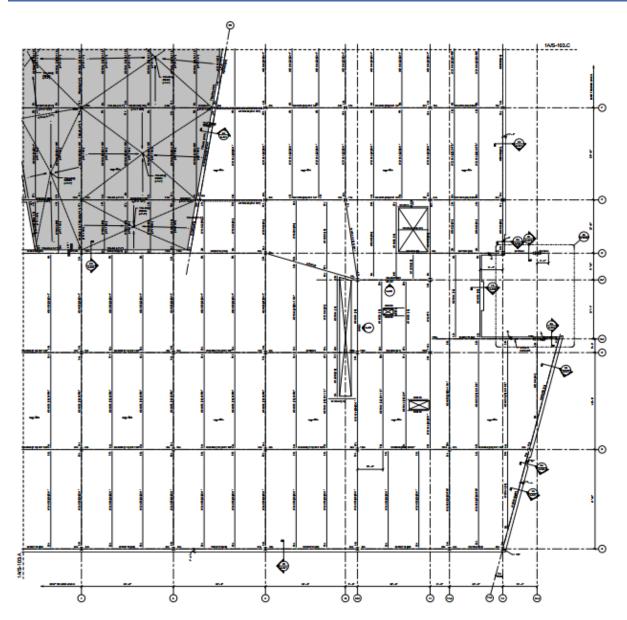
TYPICAL SEGMENT D FLOOR FRAMING PLAN
